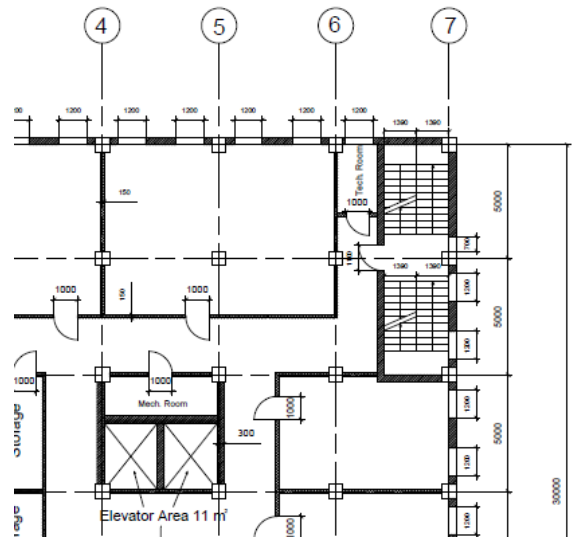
Technical drawing of fourth floor plan. Top view of a corner of a building
